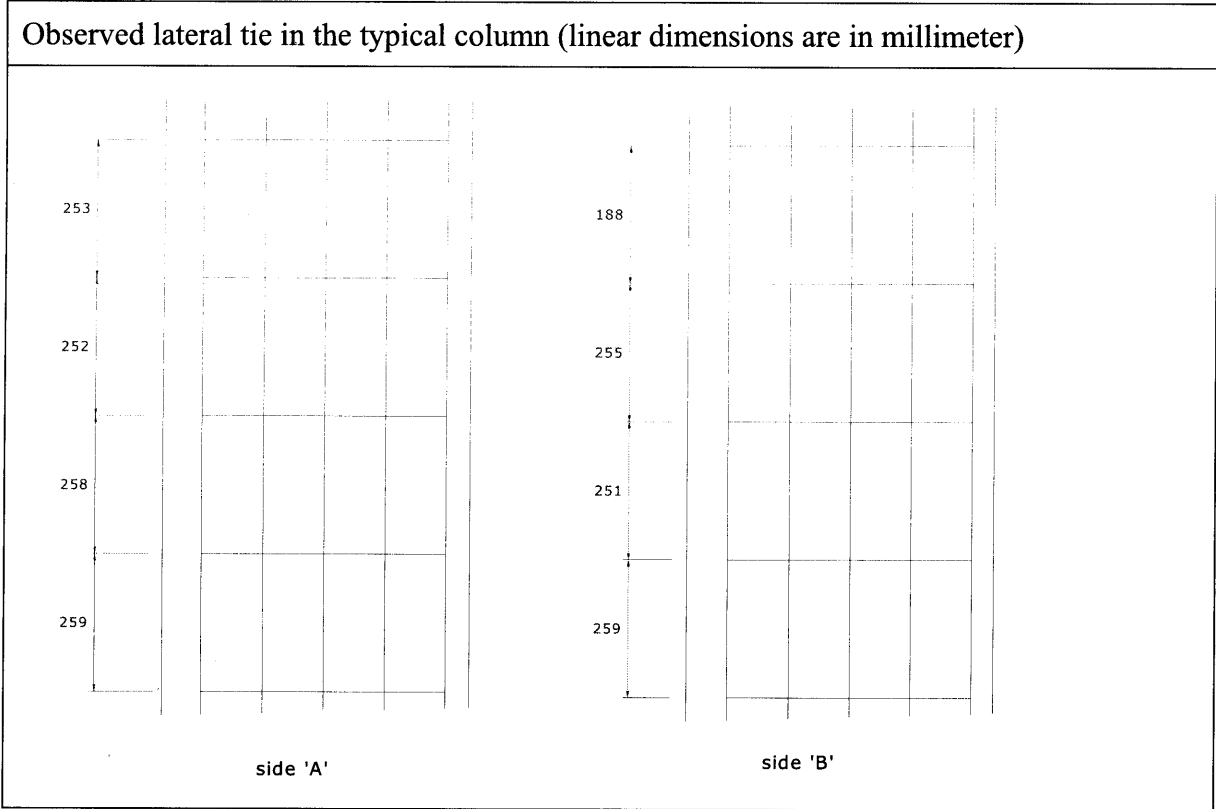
(b) Column reinforcement detection at ground floor of 11 story Tower building.
